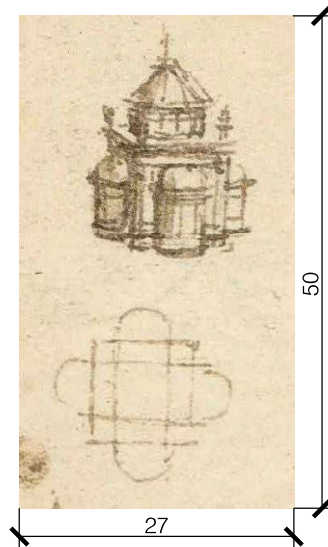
Ms. B, f. 93v: drawing of the church "A" with its dimensions in mm.
